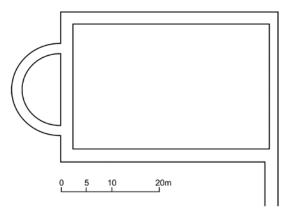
Church Field: Romano-British apsidal building excavated in 1907, with mortared flint walls surviving up to 1m high
